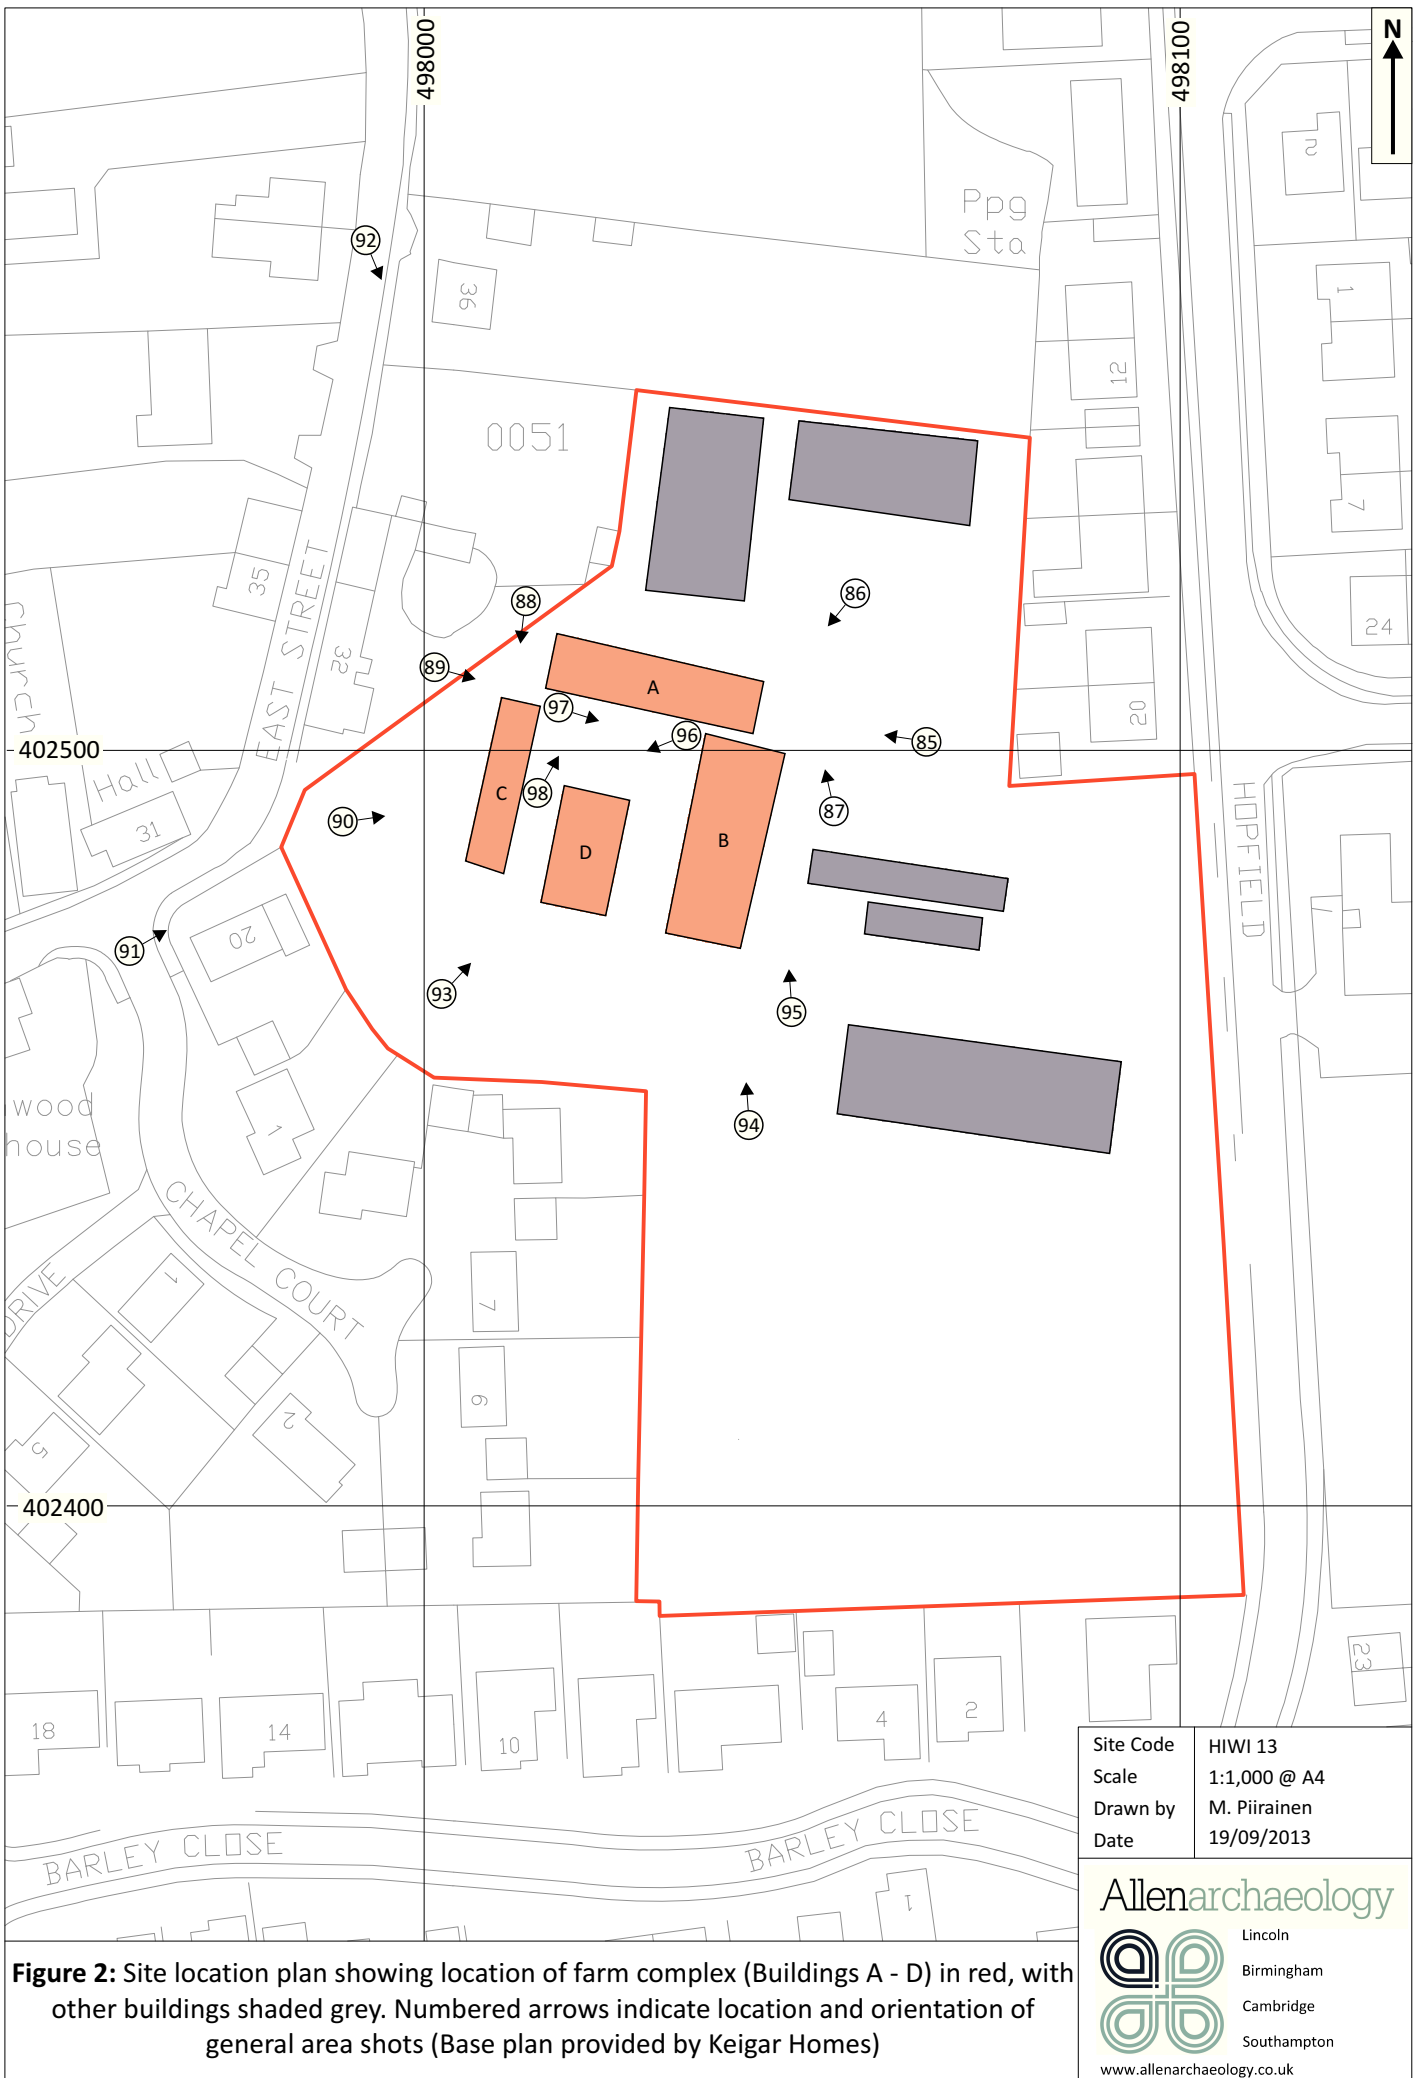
Site location plan showing location of farm complex (Buildings A - D) in red, with other buildings shaded grey. Numbered arrows indicate location and orientation of general area shots (Base plan provided by Keigar Homes)
